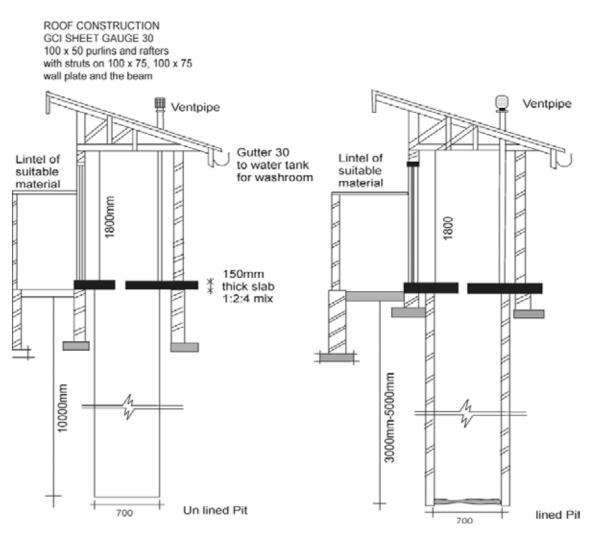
Ventilated improved pit (VIP) latrine with unlined pit (left) and lined pit (right)
